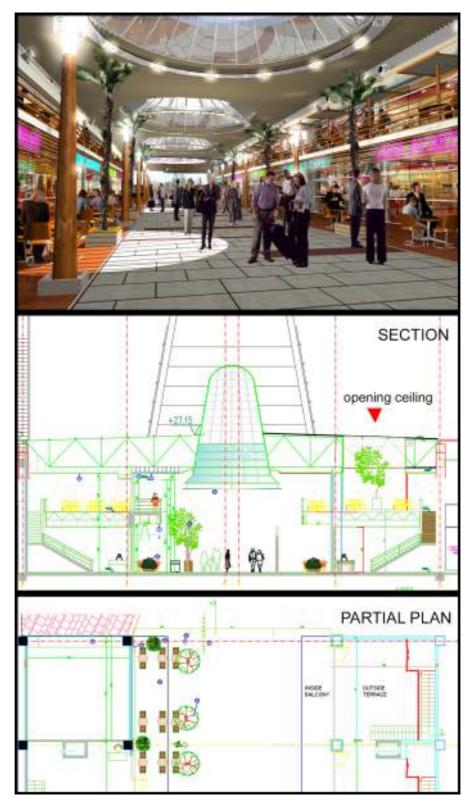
Cepa Shopping Mall, Ankara Planning to open the ceiling of the food court restaurants in future. (Öncüoğlu Architecture)
